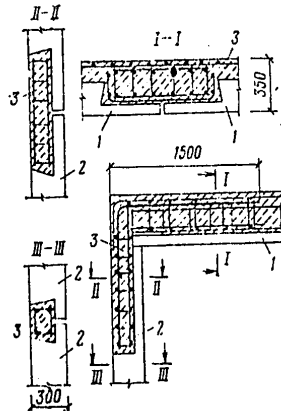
Assembly for joining wall panels to the prefabricated monolithic beam ceiling of a shelter.
